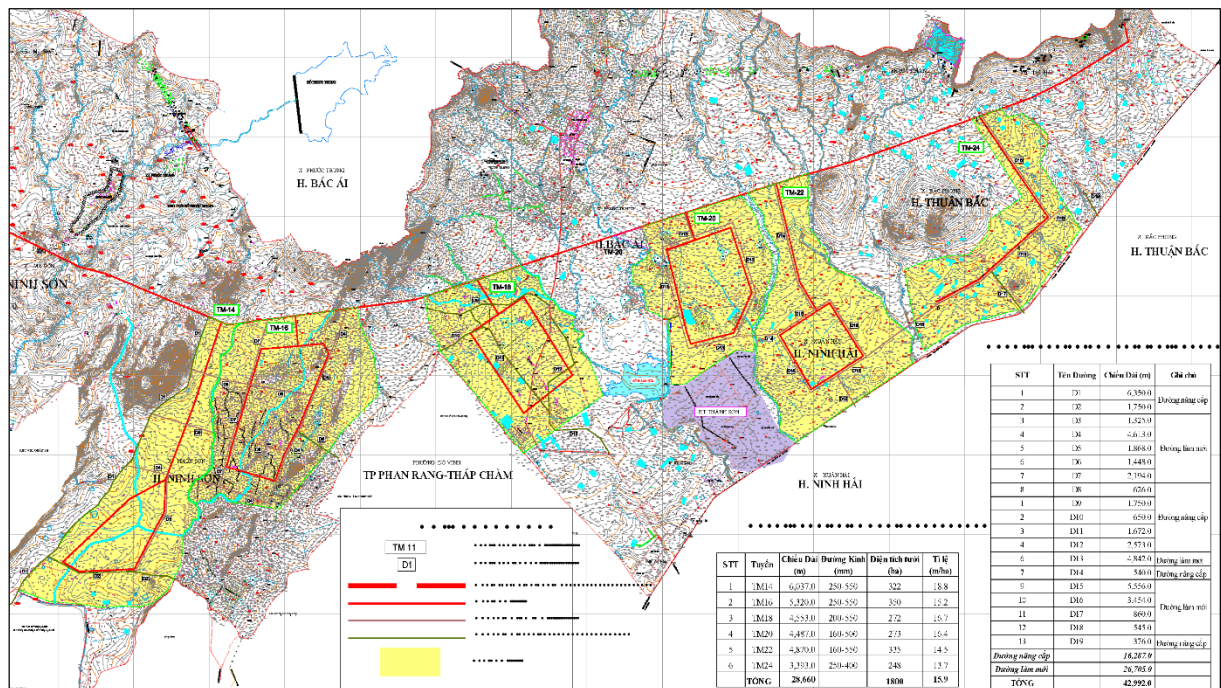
The layout of Thanh Son-Phuoc Nhon sub-project in Ninh Thuan
